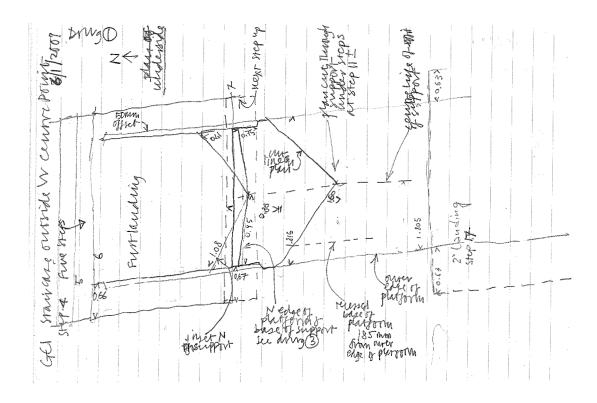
Site working drawing (1): dimensioned sketch plan of the steps, at the lower landing
